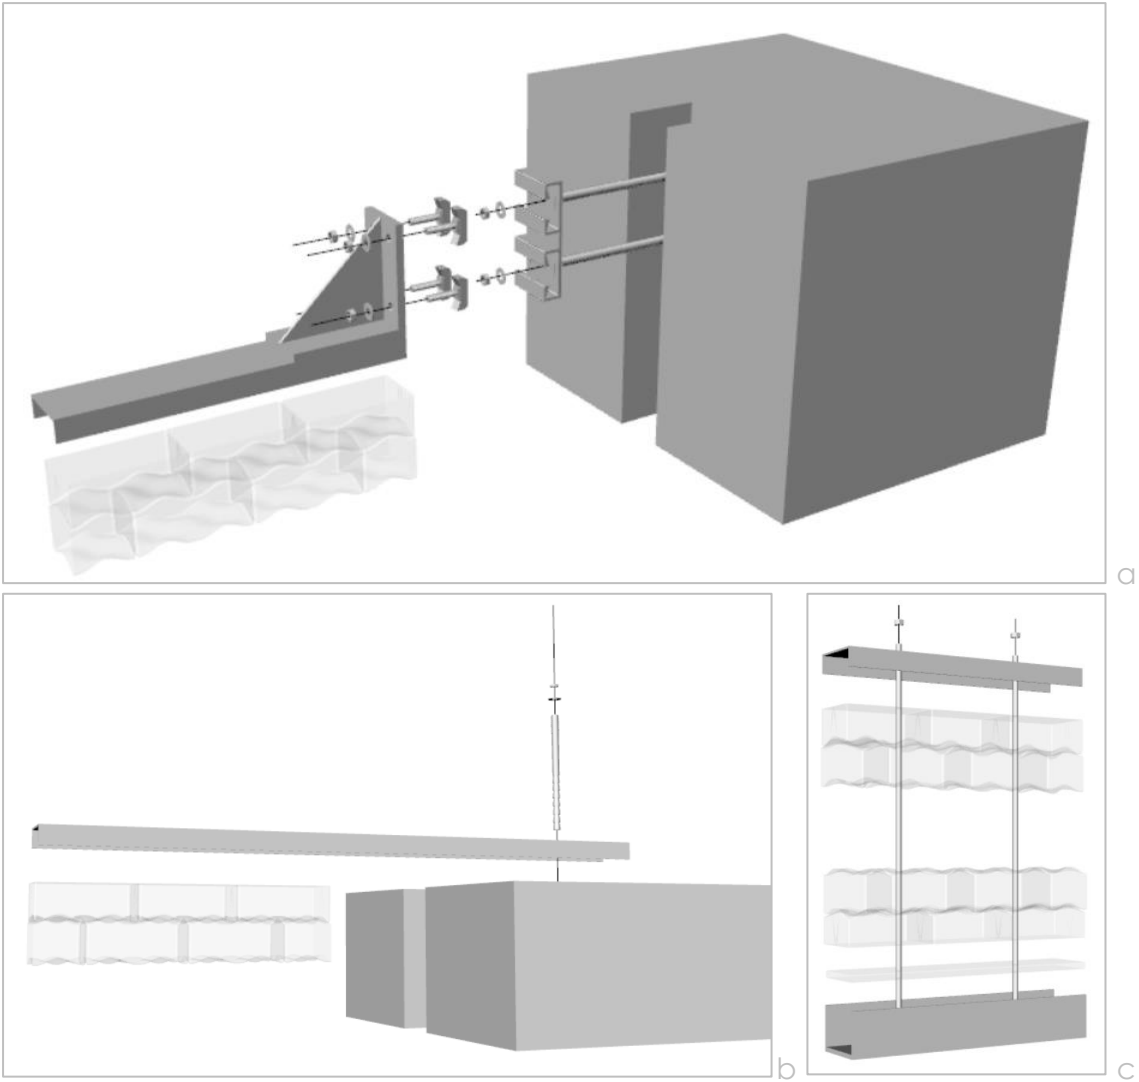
Possible top constraint connections: a) Horizontal anchoring into the wall; b) Vertical anchoring into the wall; c) post-tensioned tendon system.
